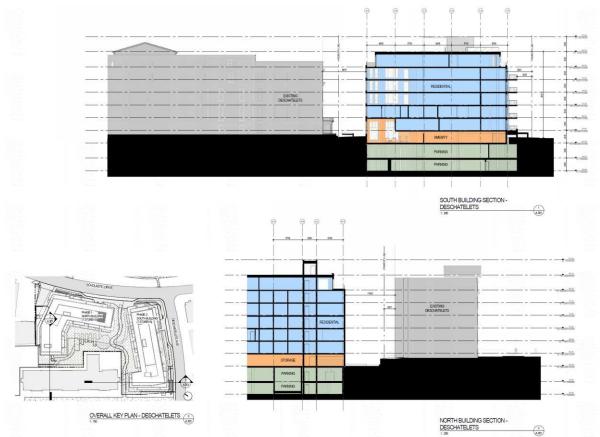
Cross section through the building illustrating the separation between the new build and the historic property.
